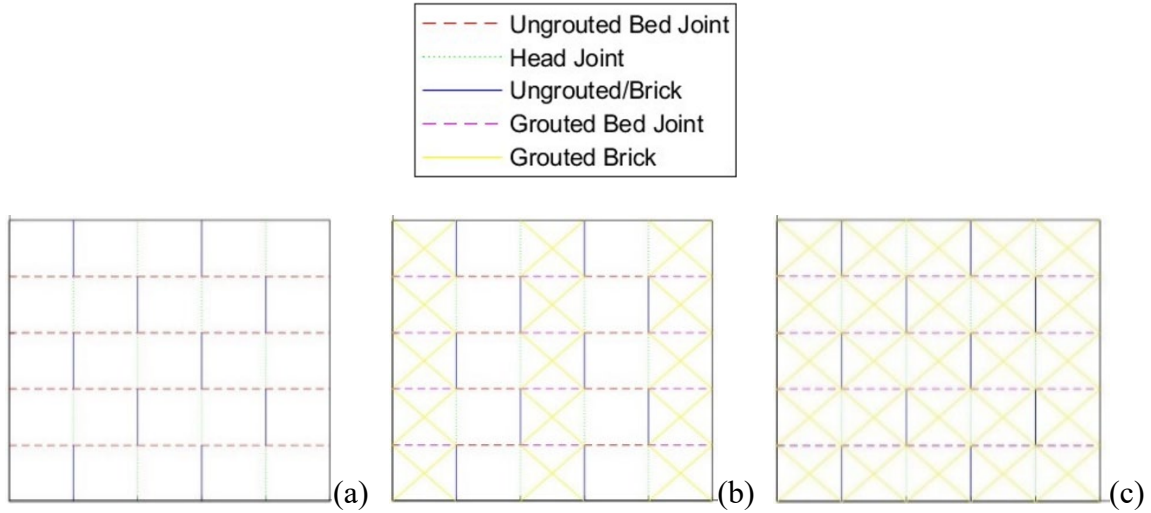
An ungrouted wall (a), A partially grouted wall (b), and a fully grouted wall (c)
